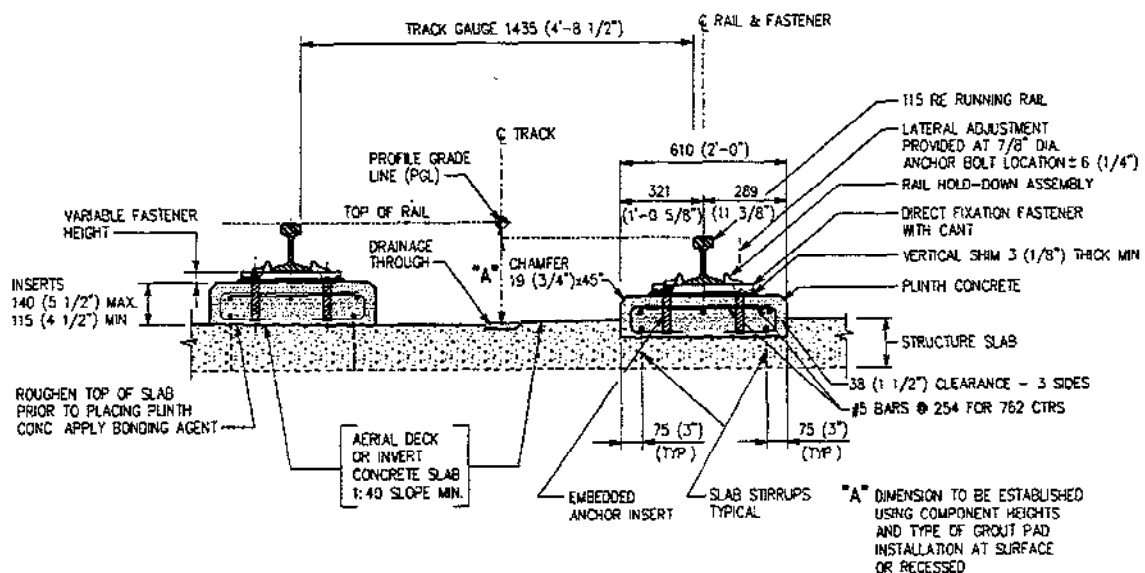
Concrete Plinth Design—Tangent Direct Fixation Track
